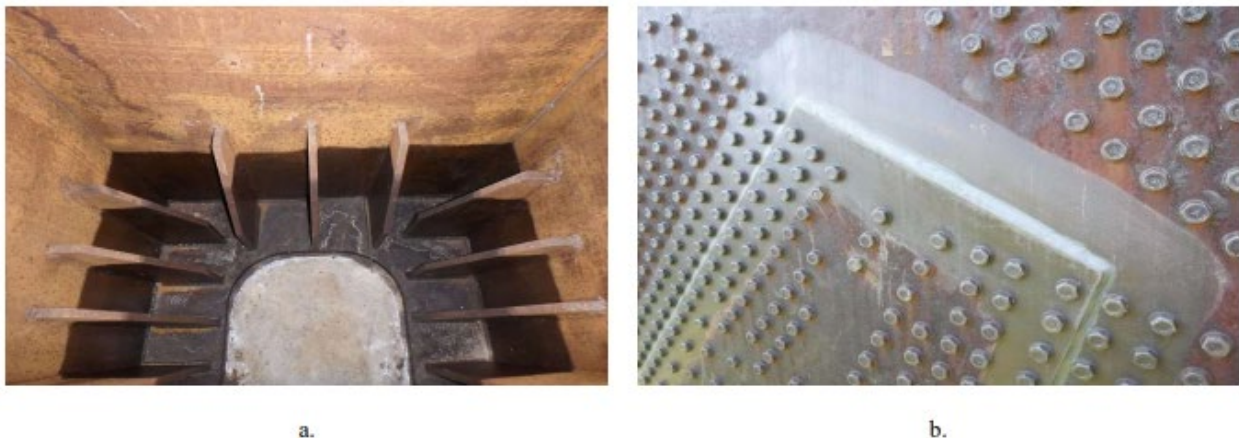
Examples of Sealing: a. Penetrating Sealer Applied to the Interior Surface of a UWS Box Column Base; b. Caulking Applied Around the Edges of a Gusset Plate Connection. (Source: NSBA/AISC 2022)
